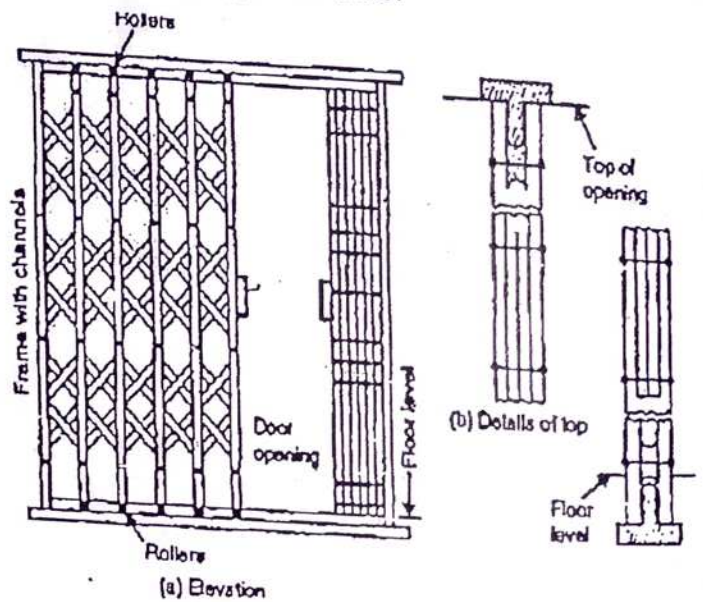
COLLAPSIBLE STEEL DOOR.
